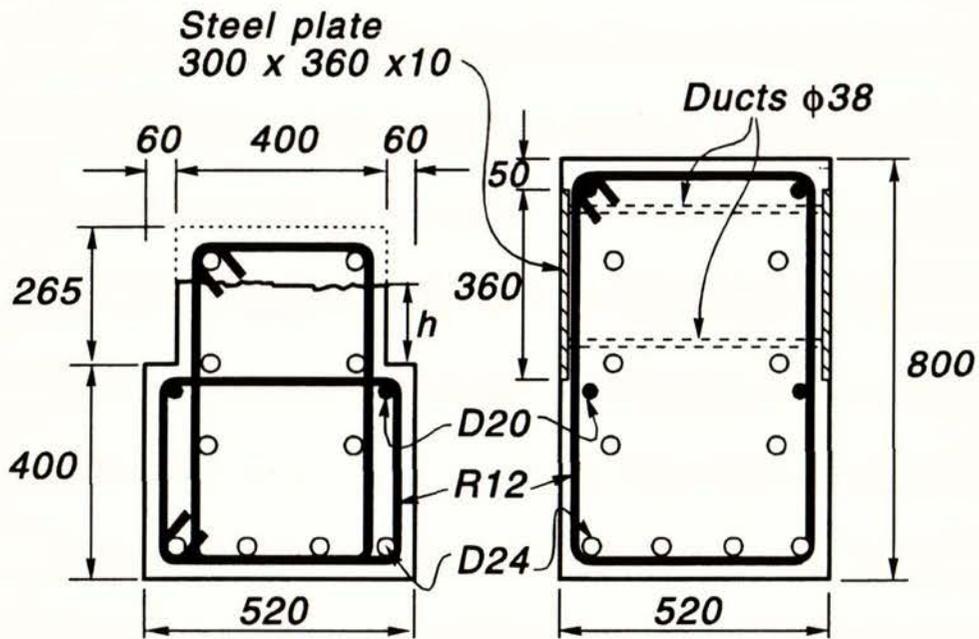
Dimensions of Precast Concrete Beam Used as Support 2.
